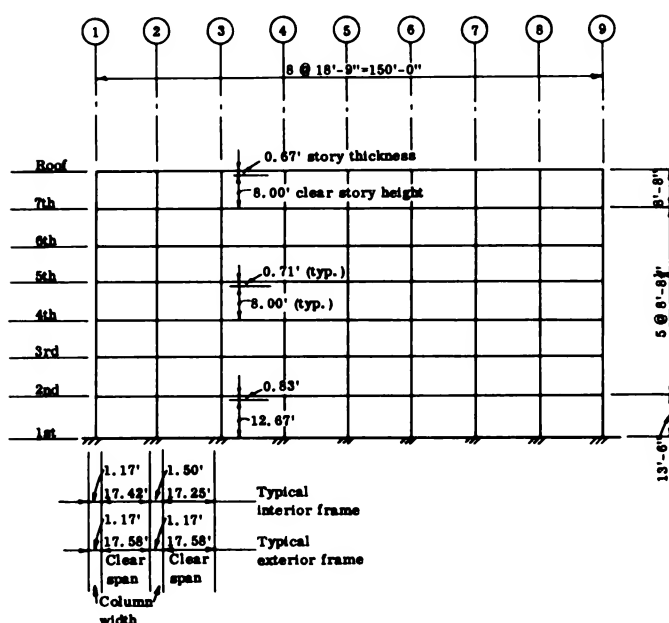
Holiday Inn, Orion Avenue. Typical longitudinal frame.
